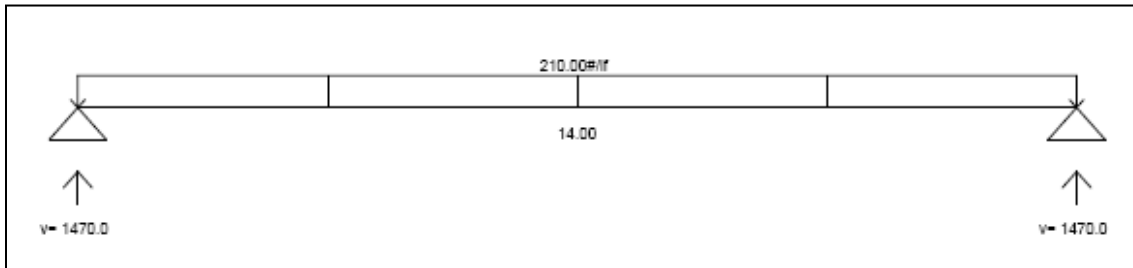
Uniform wave load on Lower wave wall beam (wale) of 210#/lineal foot, producing maximum bending moment of 61,740"#, and 0.4297" of deflection bending assuming the use of a single 8 x 8 horizontal beam.
